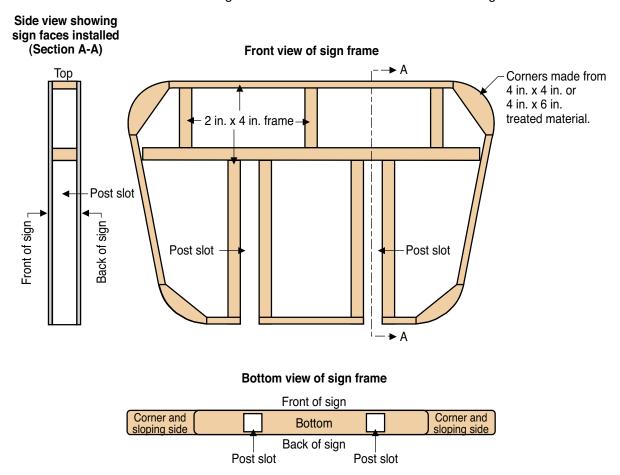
Typical construction details for fiberglass reinforced signs.
